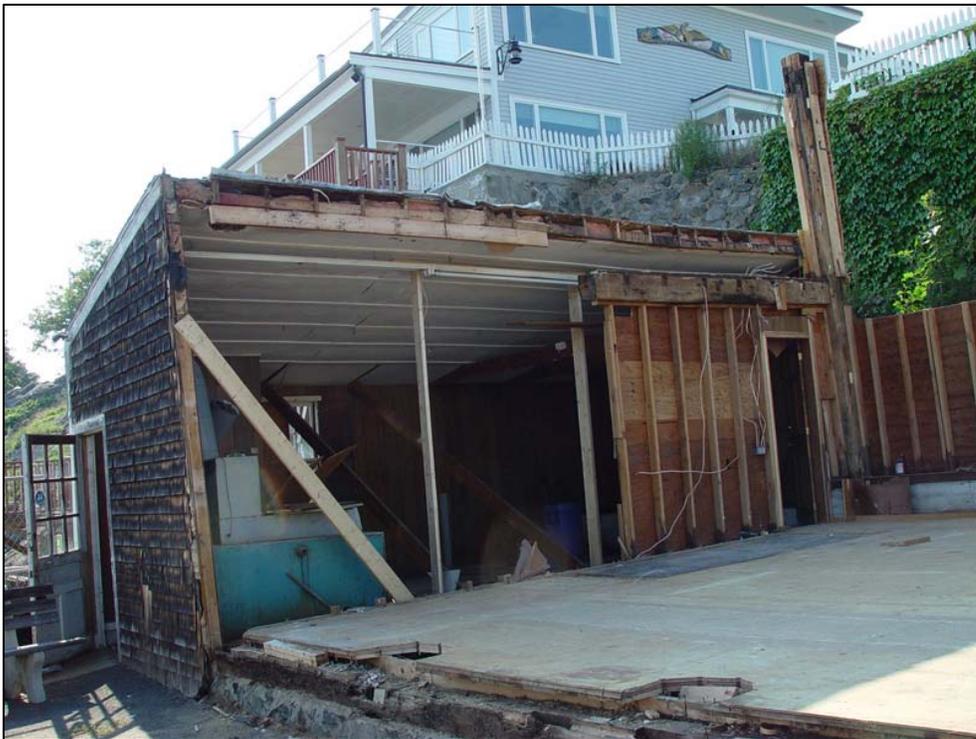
Disassembly, west wall removed; lean-to addition still standing.
